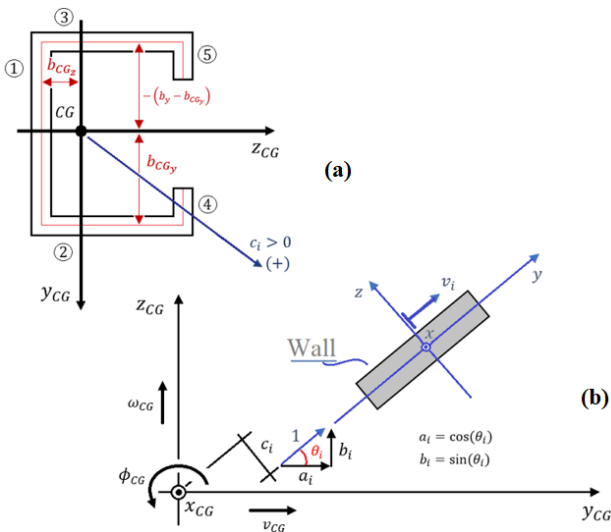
Wall panels: (a) Drawing dimension notations, (b) Wall referential transformation
